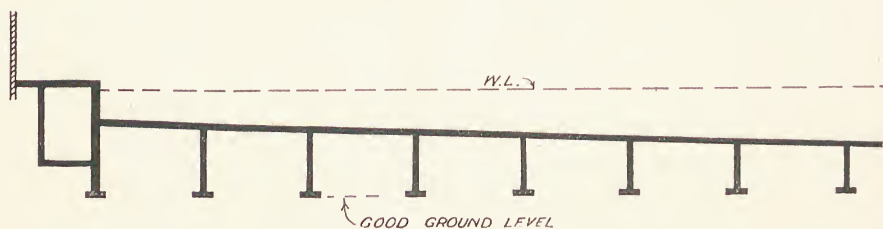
BOTTOM SLAB RESTING ON SLEEPER WALLS OF REINFORCED CONCRETE
